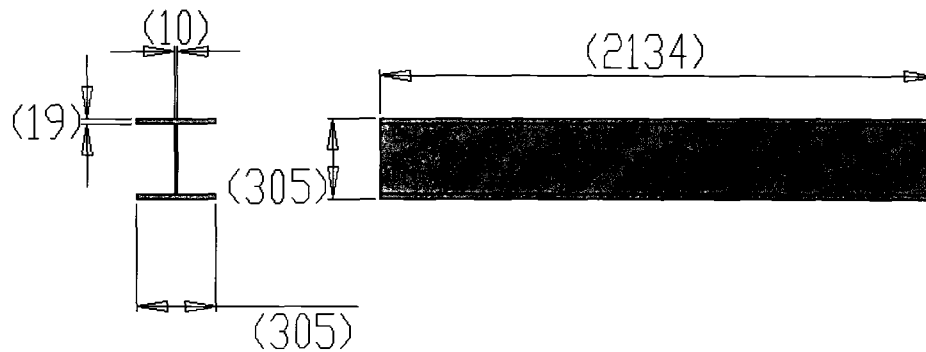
Dimensions in Millimeters of Brackets Connecting Floor Mounts to Loading Rams (NTS)
